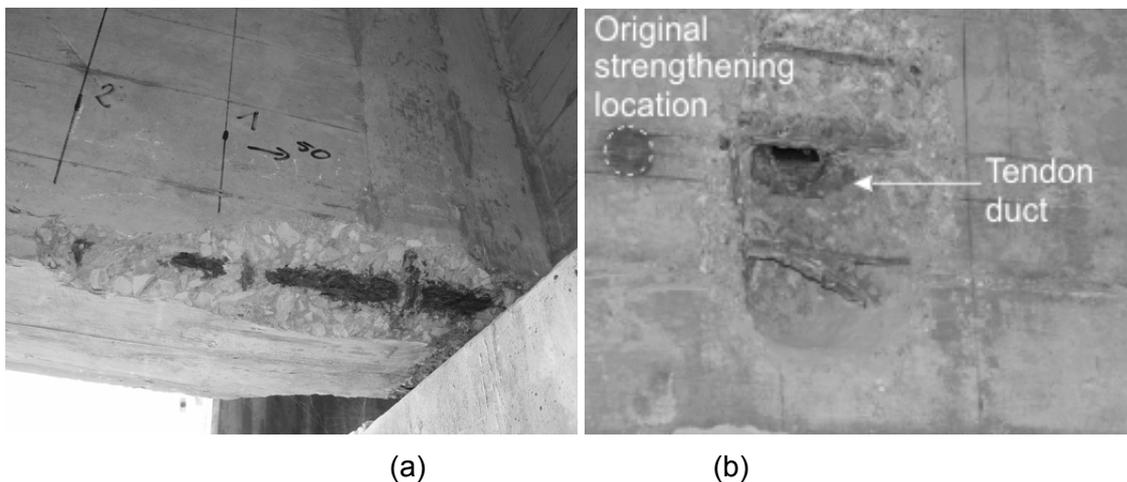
Example (a) of corrosion of the reinforcement in the Barra bridge and (b) window opened in a longitudinal beam for the detection of tendon ducts in the Lanheses Bridge.
